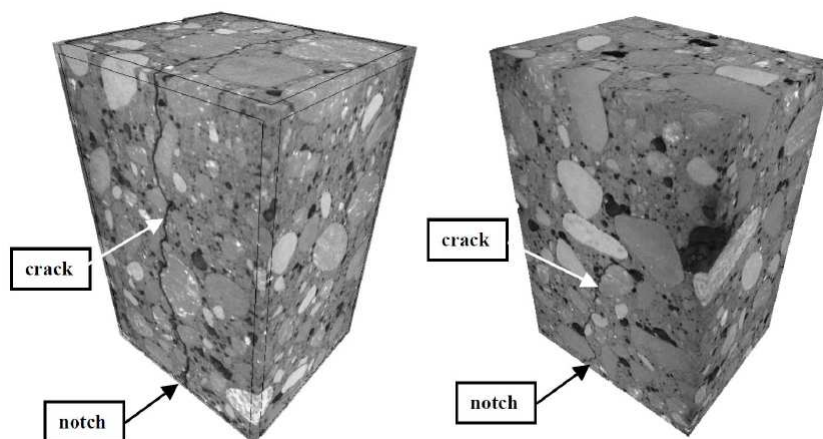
μCT -images of concrete cracked cuboids cut out from beam '1' (left) and '2' (right).
